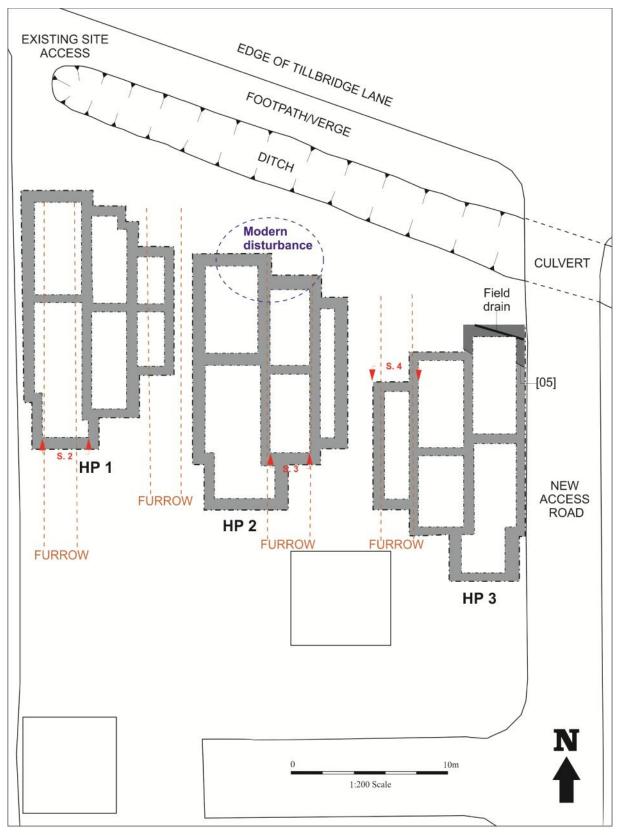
General plan showing monitored excavated area at scale 1:200.
